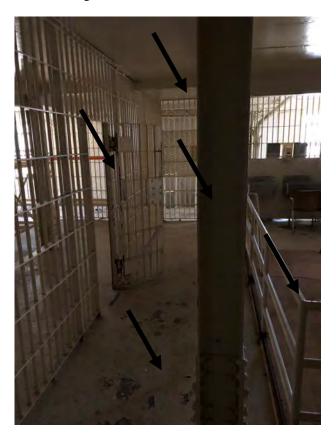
LBP Positives; White Concrete Floor, Metal Bars and Handrails, and Metal Beams.
